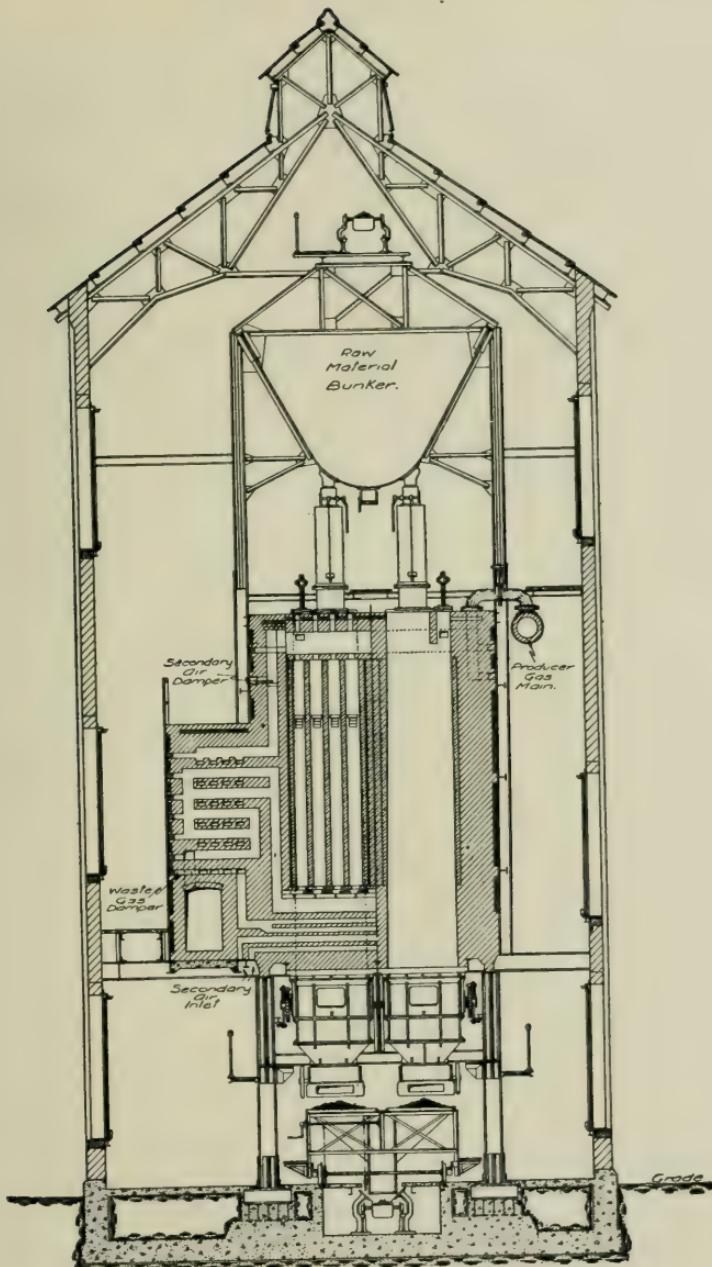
SECTIONAL ELEVATION OF TYPICAL INSTALLATION
